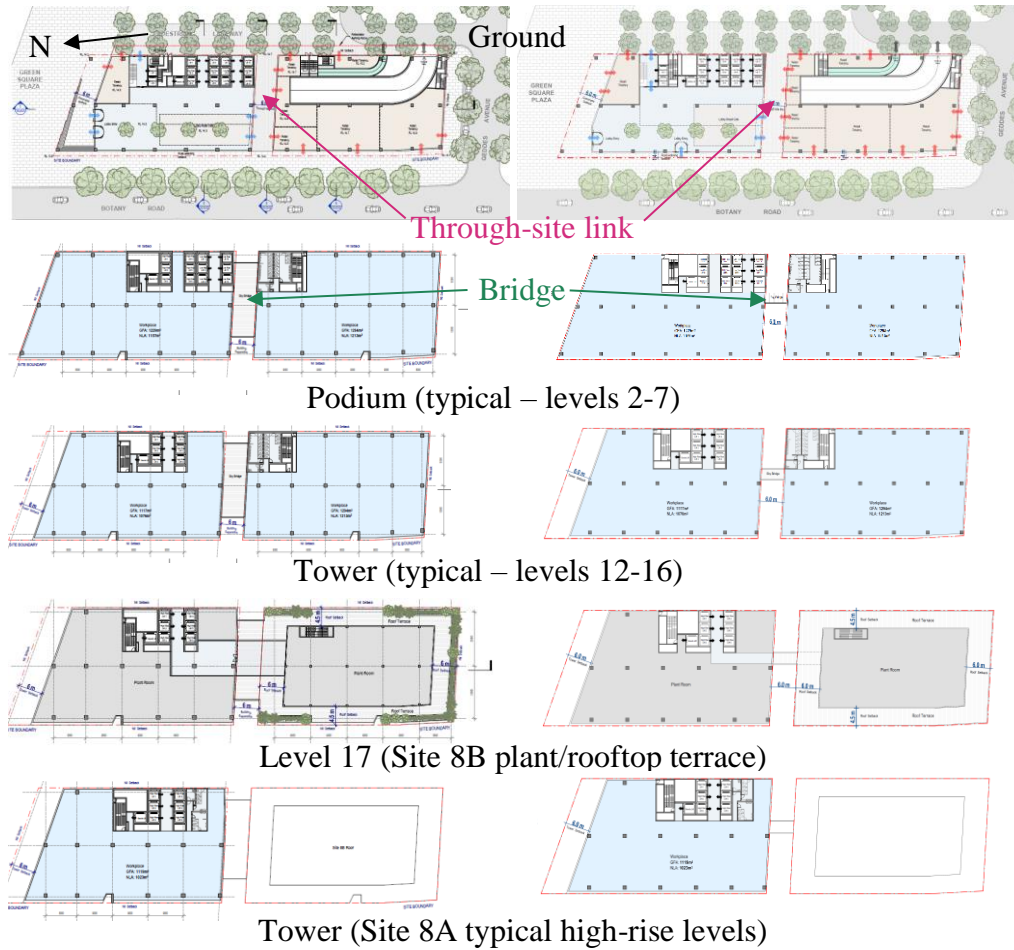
Various floor plans – 20 m wide bridge (L), 3 m wide bridge (R)
